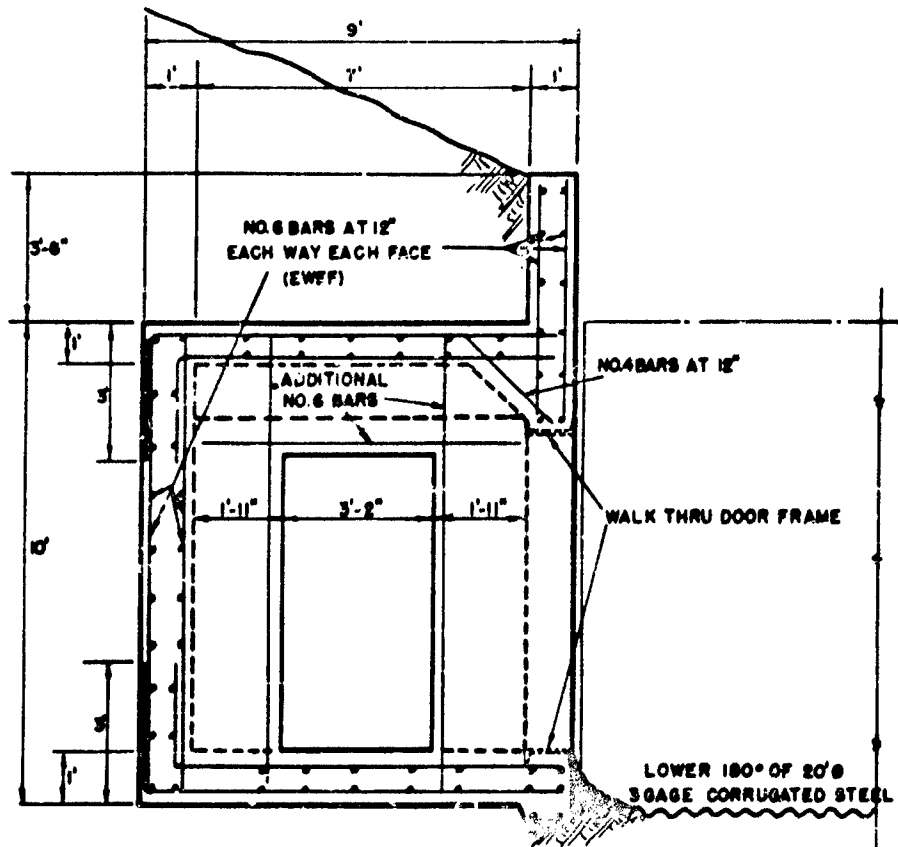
Exterior walk-through door foundation; Section C-C.
